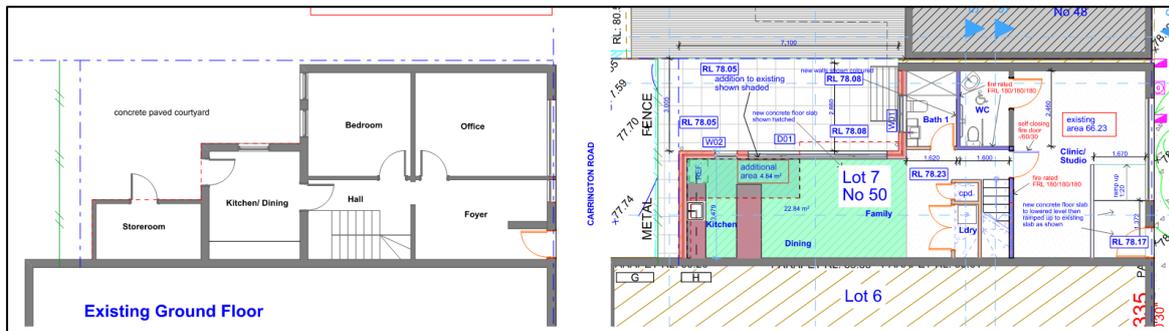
Existing and Proposed Ground Floor Plan - DA/4/2022 - 50-54 Carrington Road, Randwick NSW 2031
